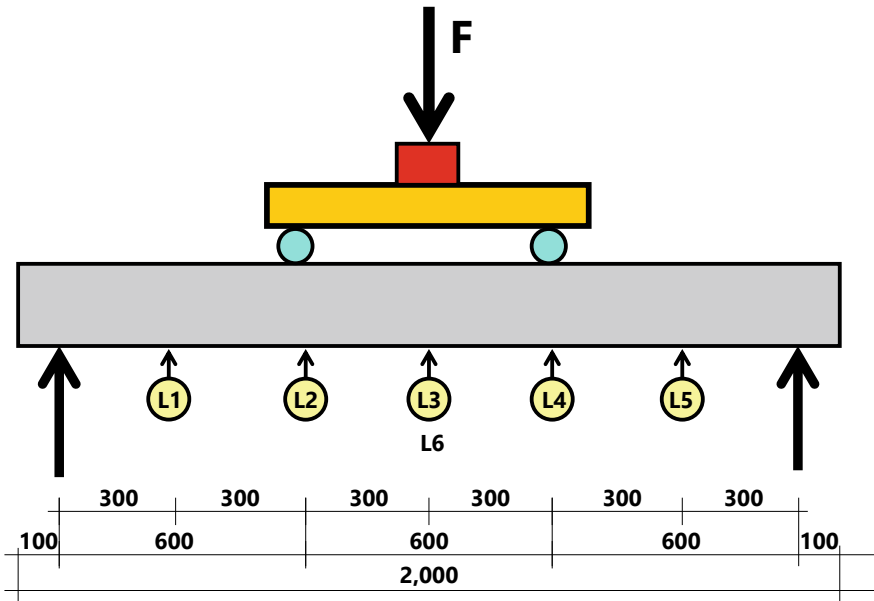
Set-up to undertake experimental study of concrete beams of *rectangular* cross-section reinforced with FRP bars
